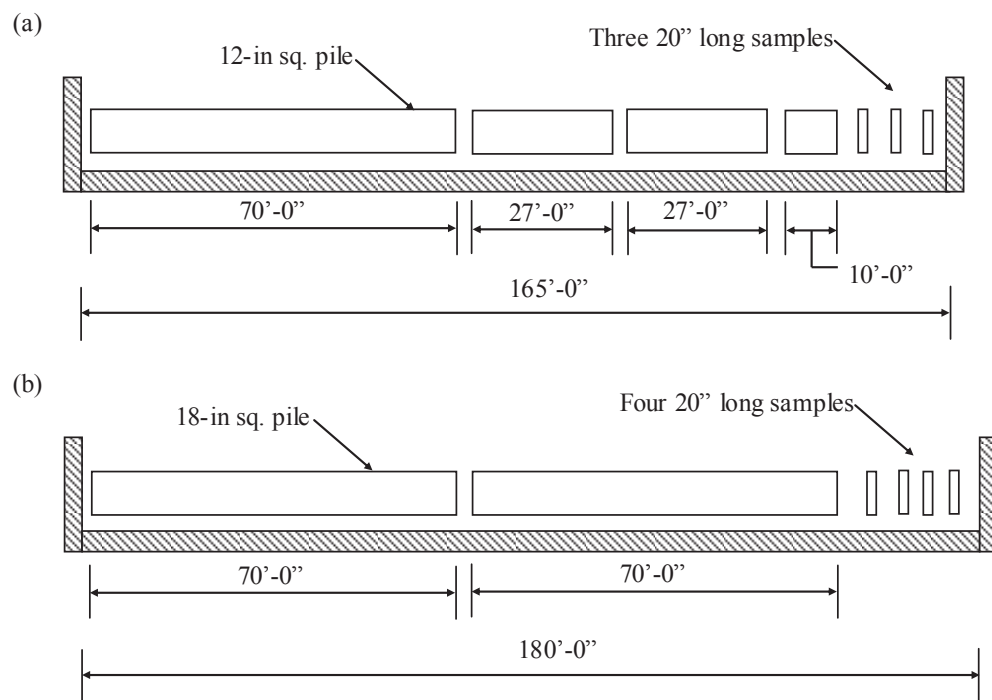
Construction layouts for (a) 12-in. (30 cm) sq. and (b) 18-in. (46 cm) sq.
